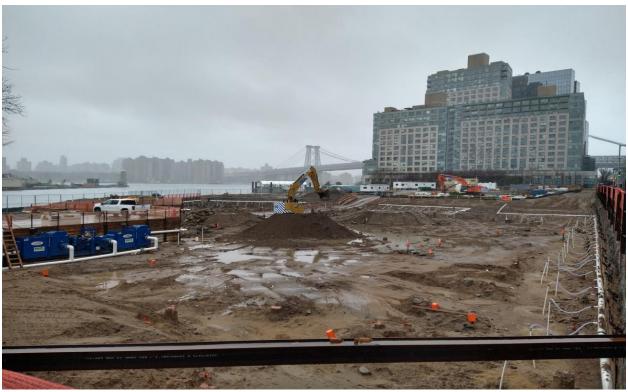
Spoil relocation looking northwest from Kent Avenue and Division Avenue.
